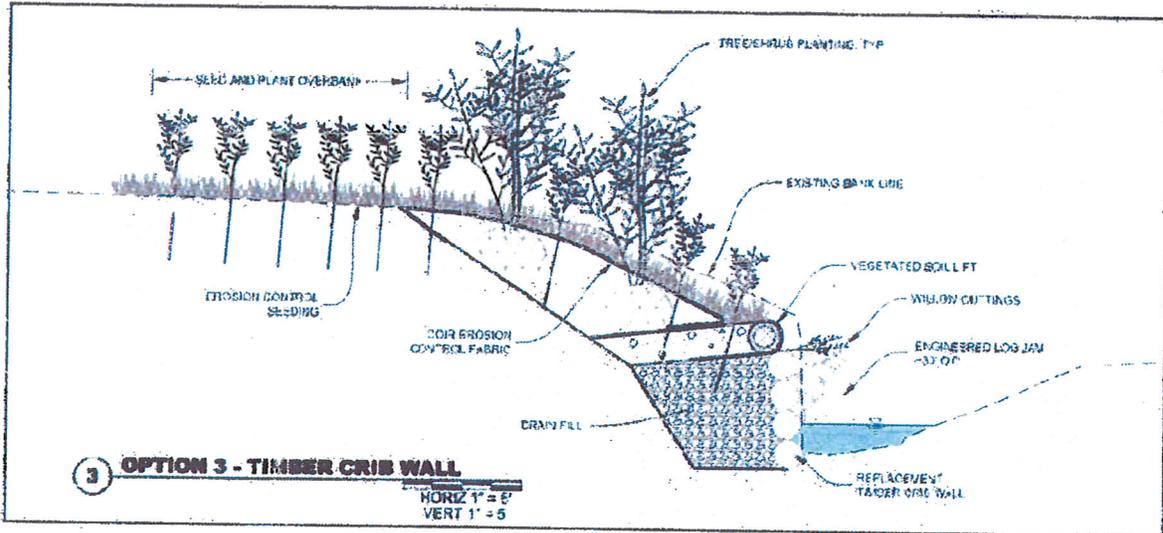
Schematic of crib wall replacement with upper slope planting.
